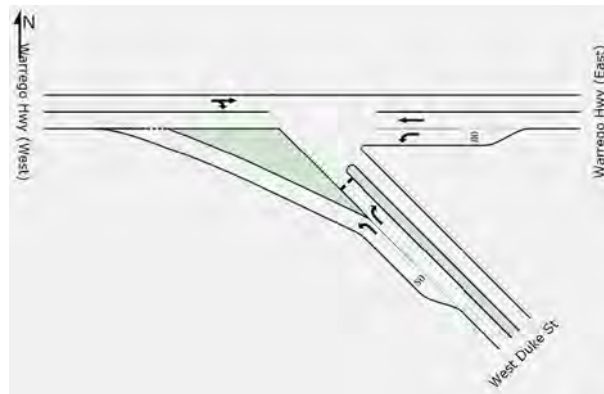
F: Existing intersection Layout – West Duke Street/ Warrego Highway
